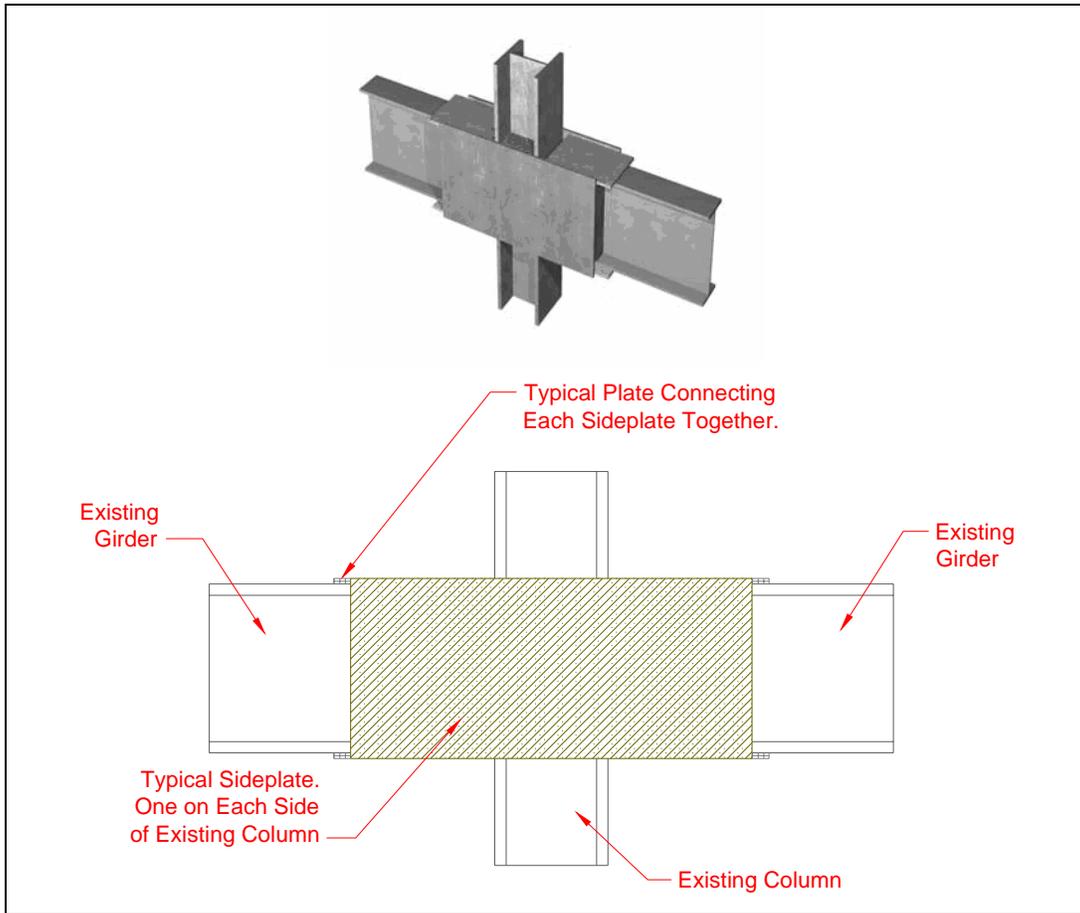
Enhanced structural steel connection (upper illustration Houghton and Karns 2001).
